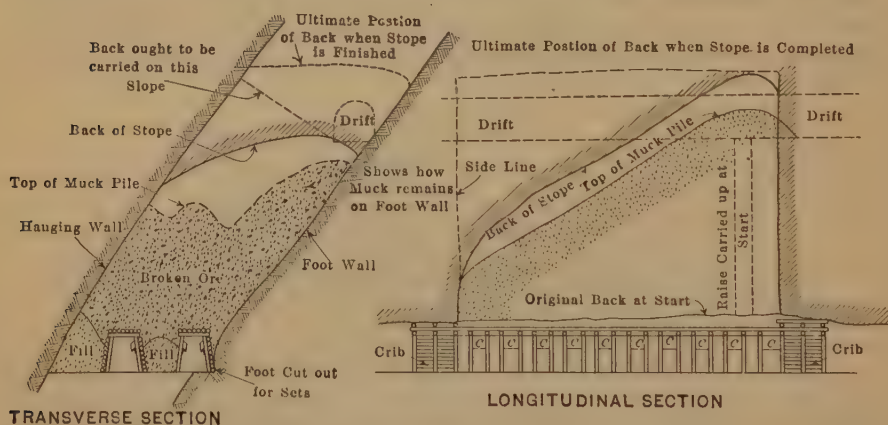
SECTIONS OF LONGITUDINAL STOPE.
